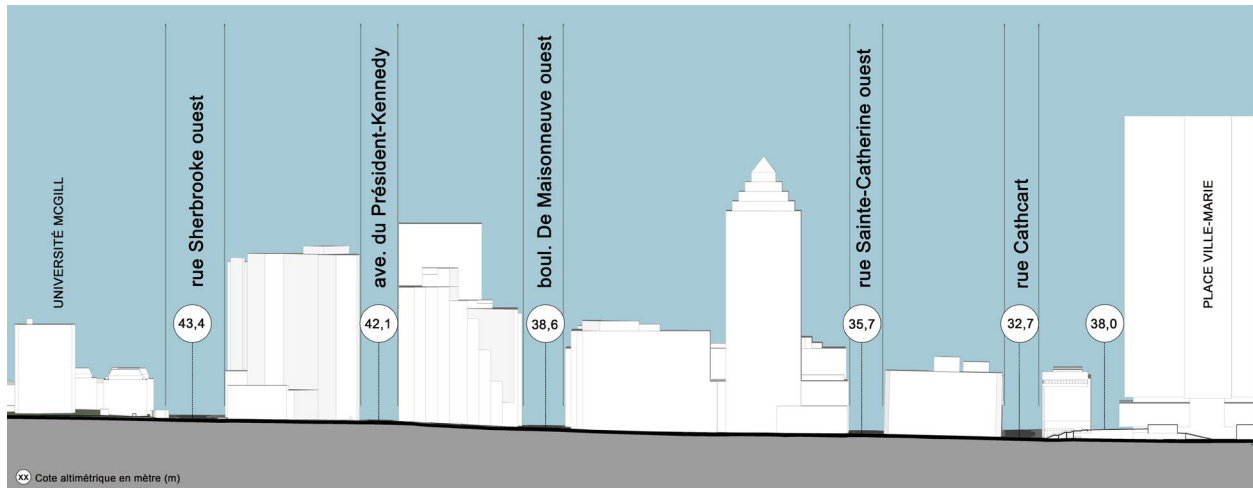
Elevation levels of Avenue McGill College (source: Groupe Rousseau-Lefebvre, 2019).
